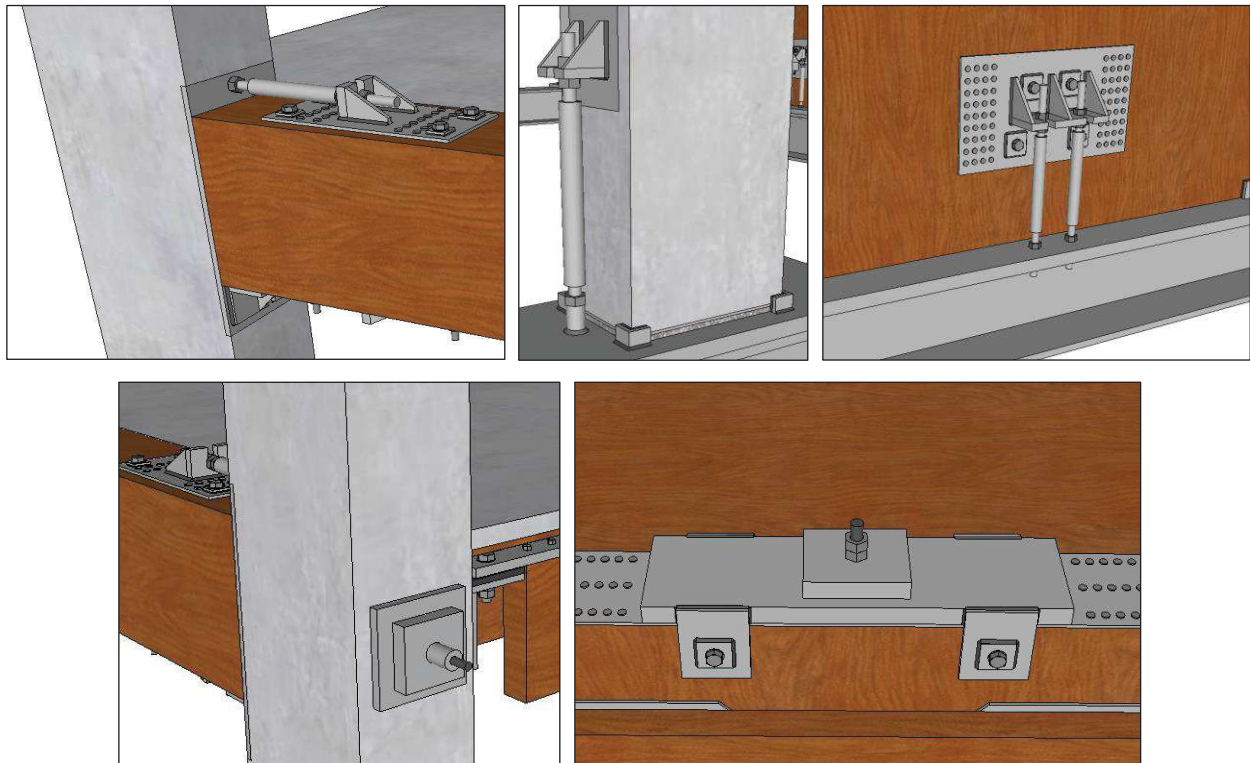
Detailing of the hybrid connections: connection of dissipaters to the beam and column in an external joint (top - left), connection of external dissipaters to the column/wall and to the steel foundation (top - centre and right), anchorage for the wire strands of the timber beams (bottom - left), upper anchorage of the post-tensioned bar of the wall (bottom - right).
